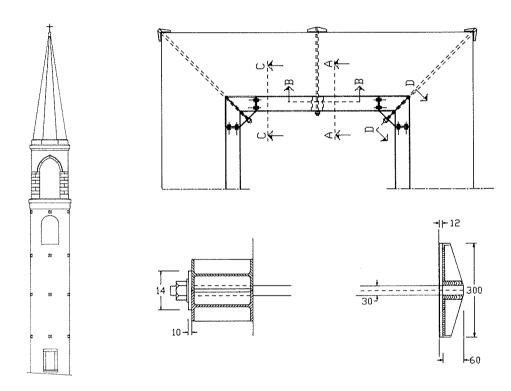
General view and details of the steel works made for strengthening the bell tower.
